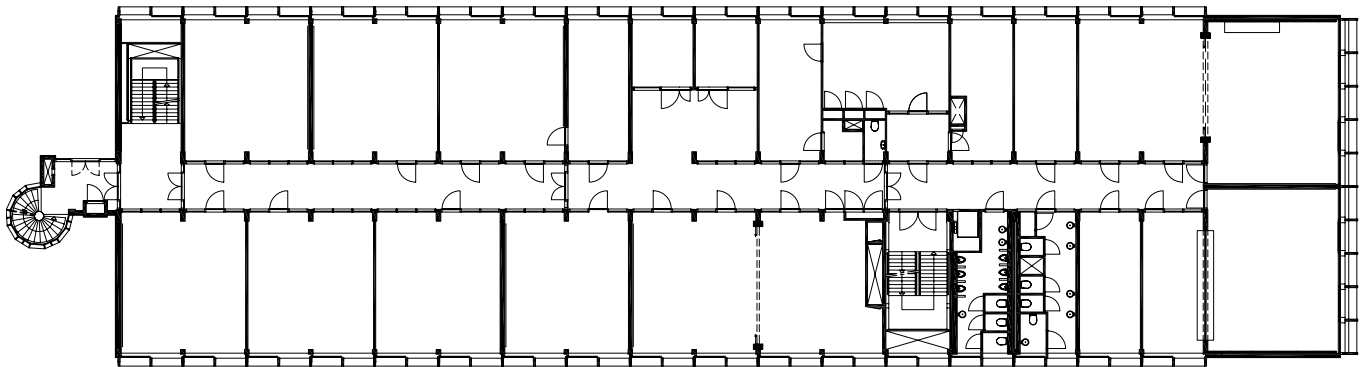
A typical floor plan of the school building in use as a grammar school today; the previously existing floor plan is shown in FIG. 5.12 / Wessel de Jonge Architects, Rotterdam
